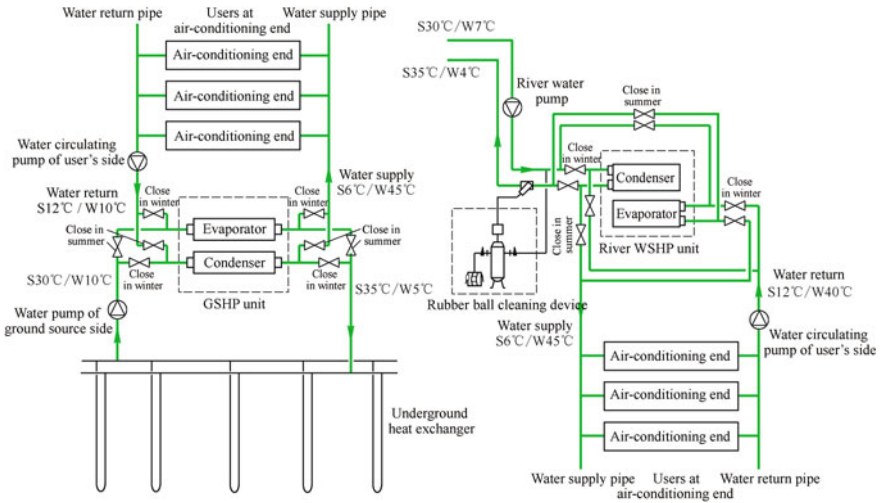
Joint design of Expo Axis river water and ground source heat pump (source China Construction News)
